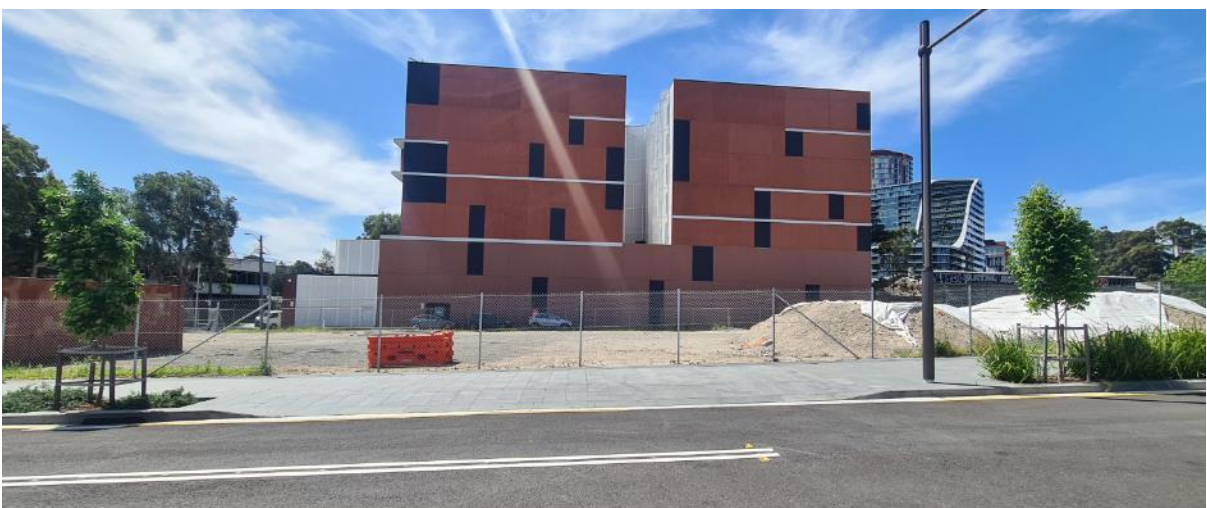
View looking north at the driveway access to Ngamuru Avenue
